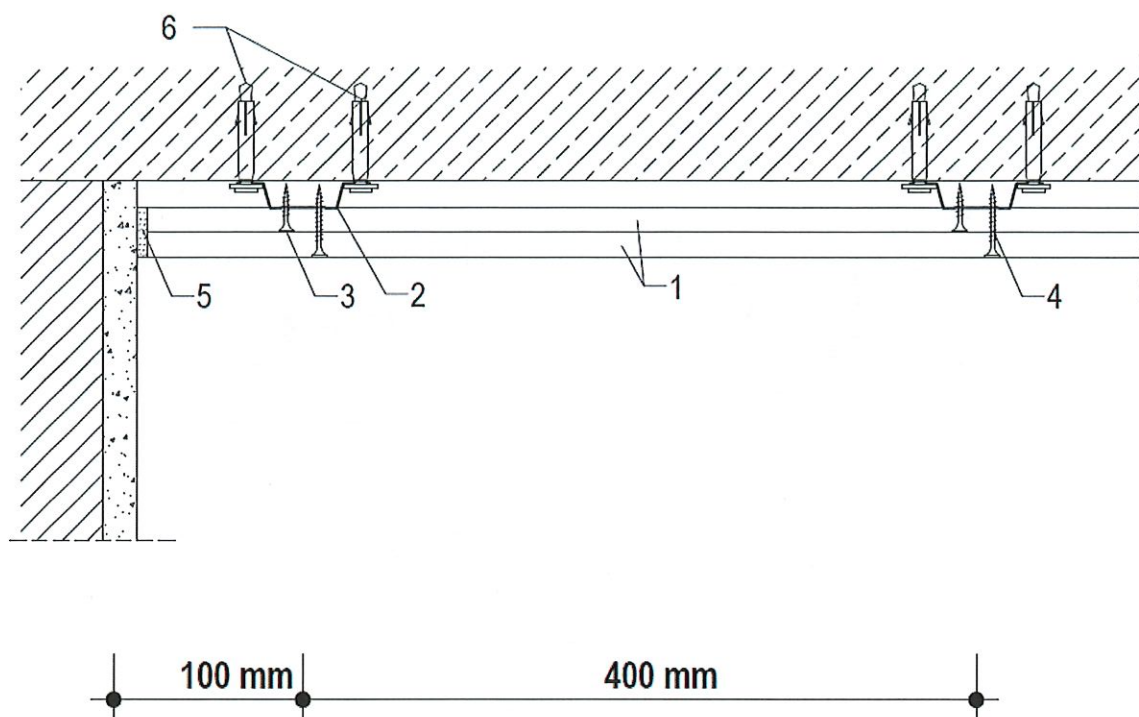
Longitudinal section of the ceiling lining suspended on hangers ES 60 or ES 60 plus
